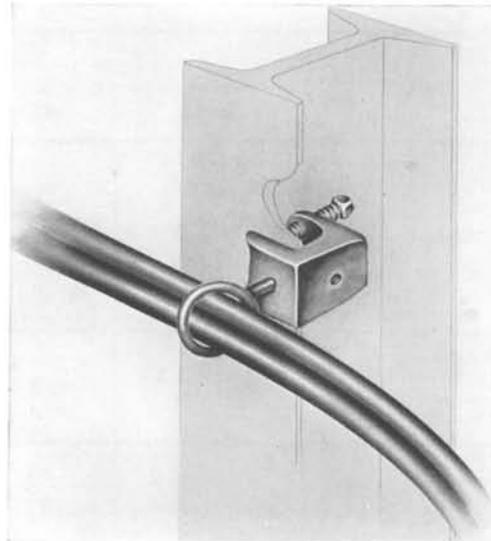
NO. 509 UNIVERSAL INSULATOR SUPPORT
